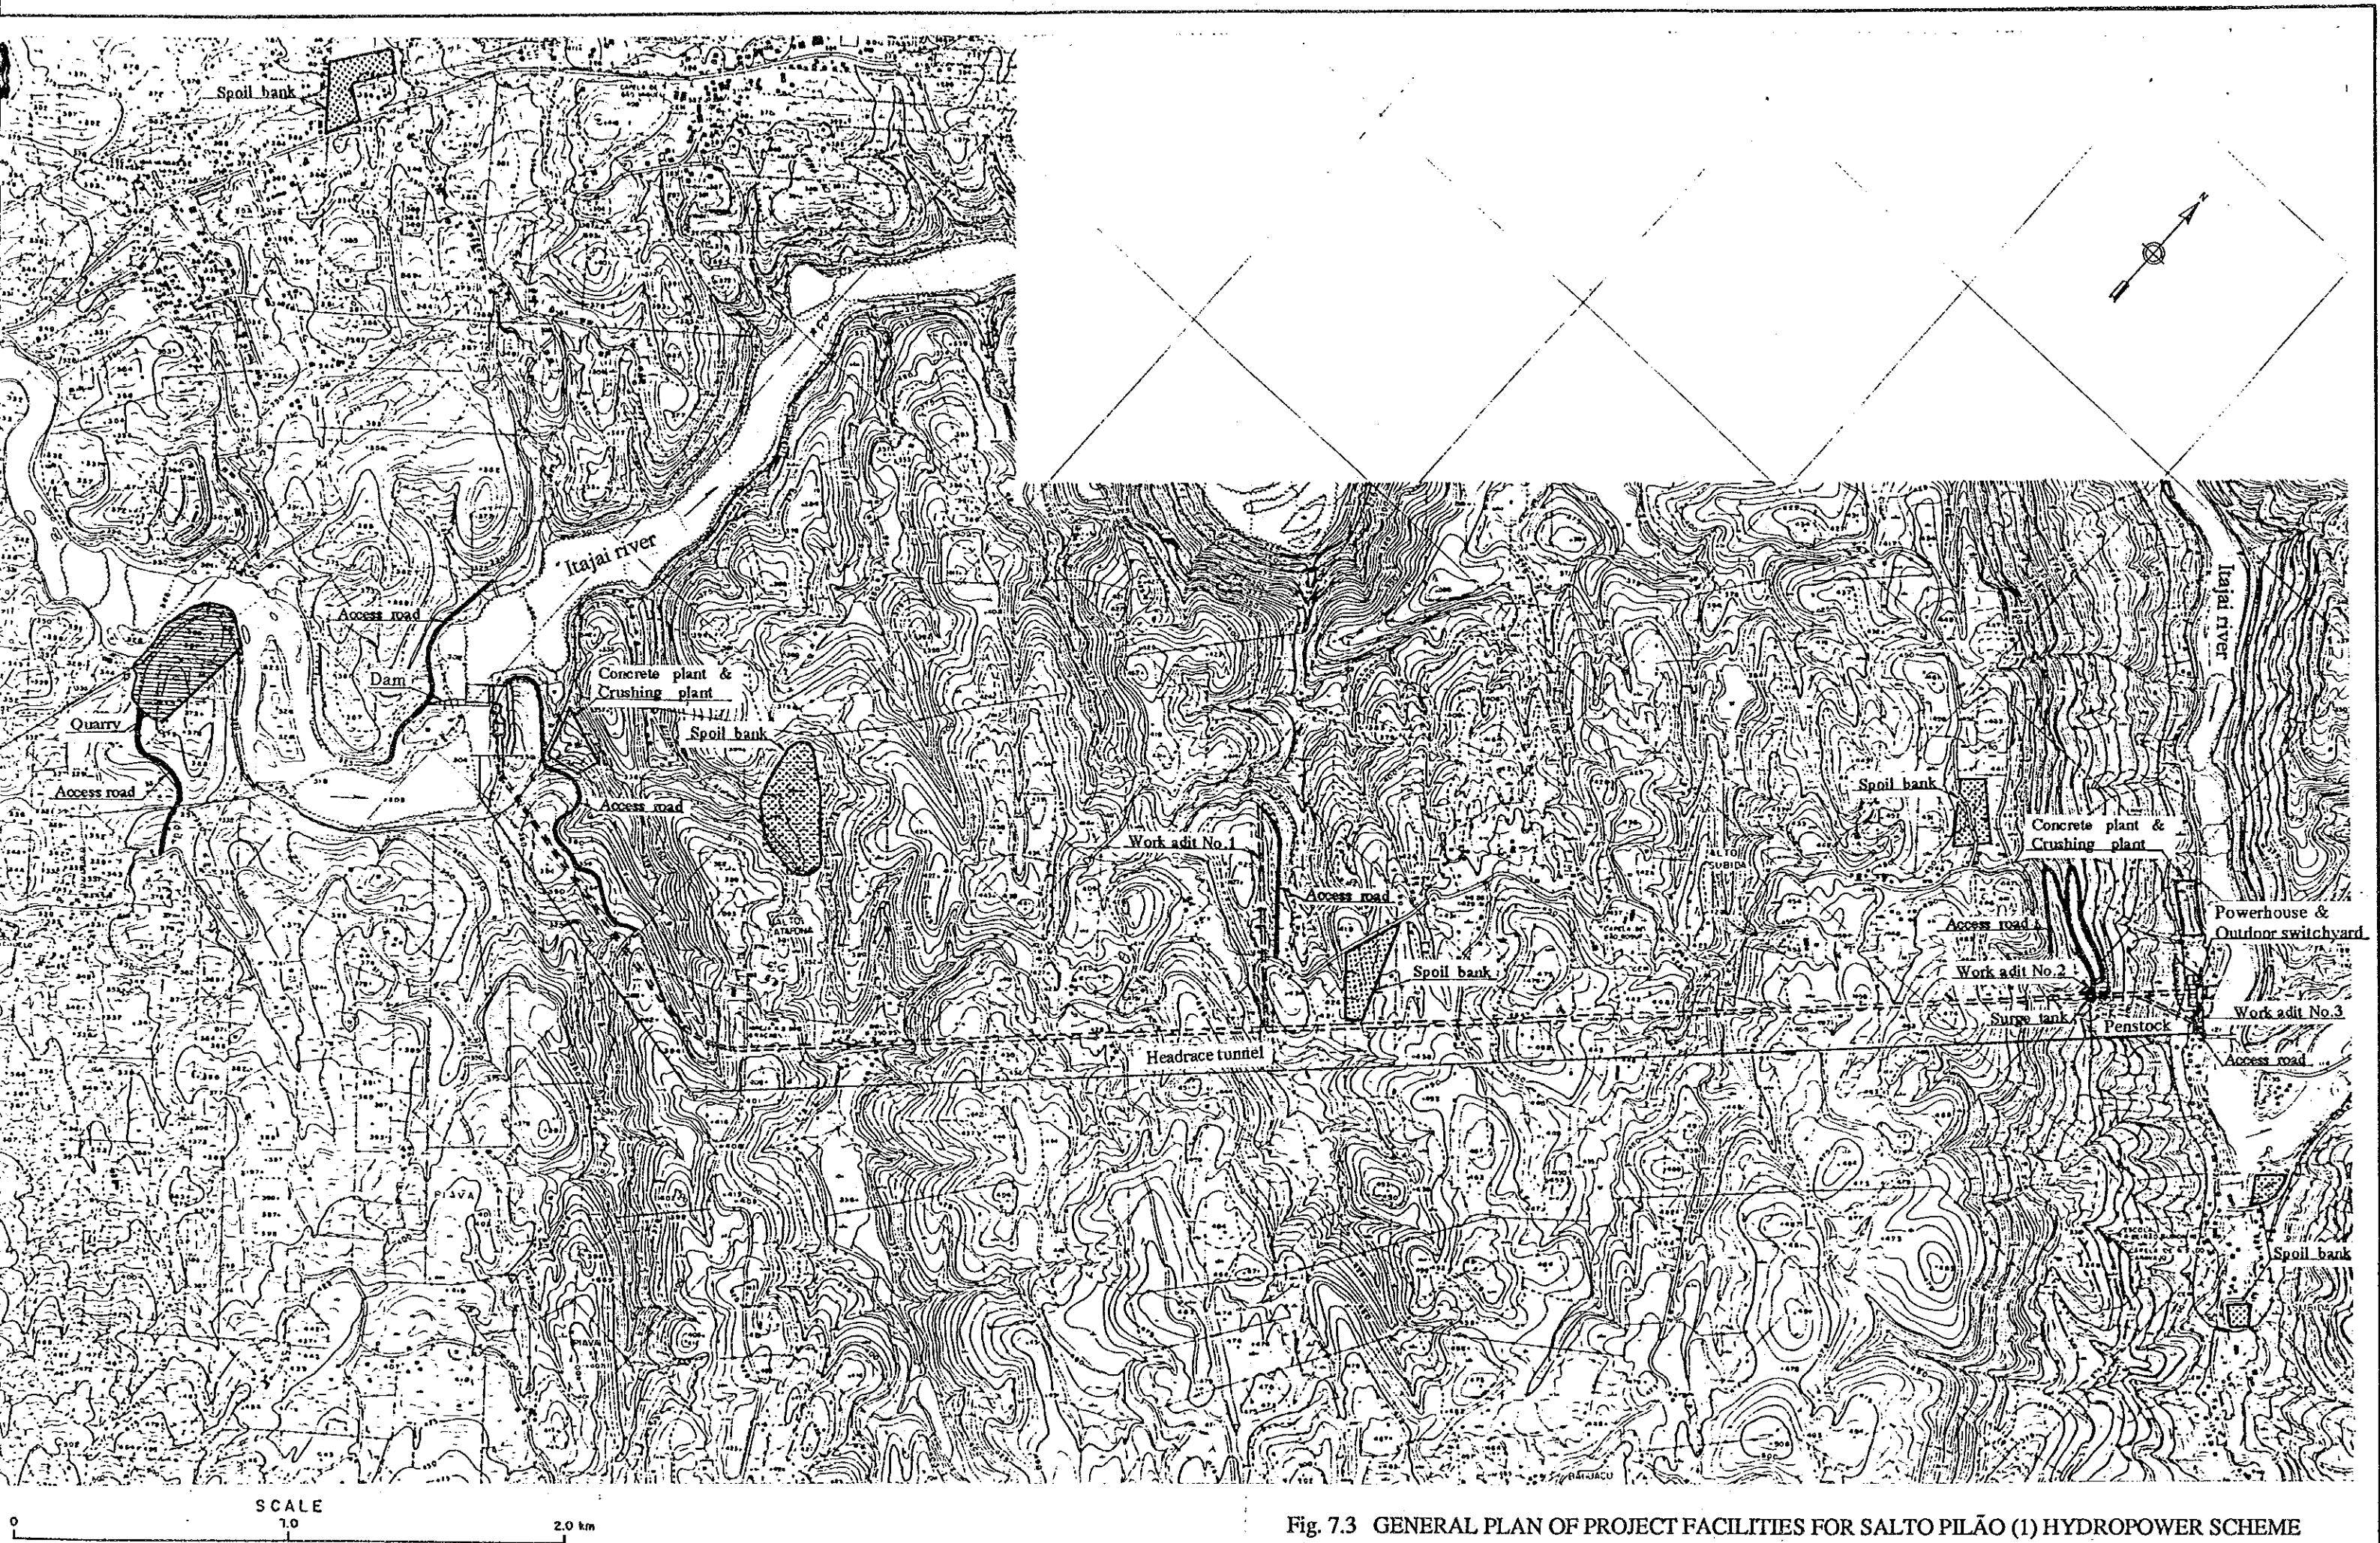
GENERAL PLAN OF PROJECT FACILITIES FOR SALTO PILÃO (1) HYDROPOWER SCHEME
